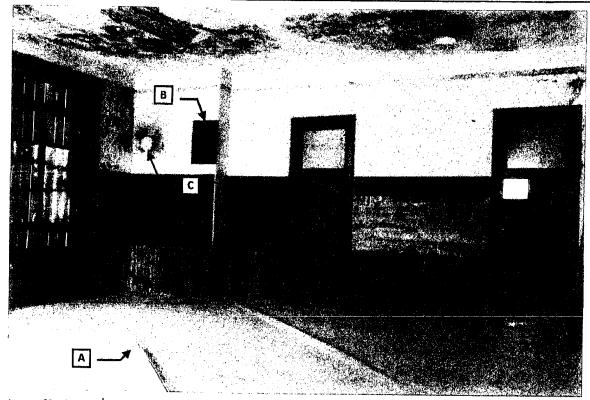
Room 1 view north. (A) Floorboards are warped, (B) Heating vent, (C) Wood burning stove duct opening.
